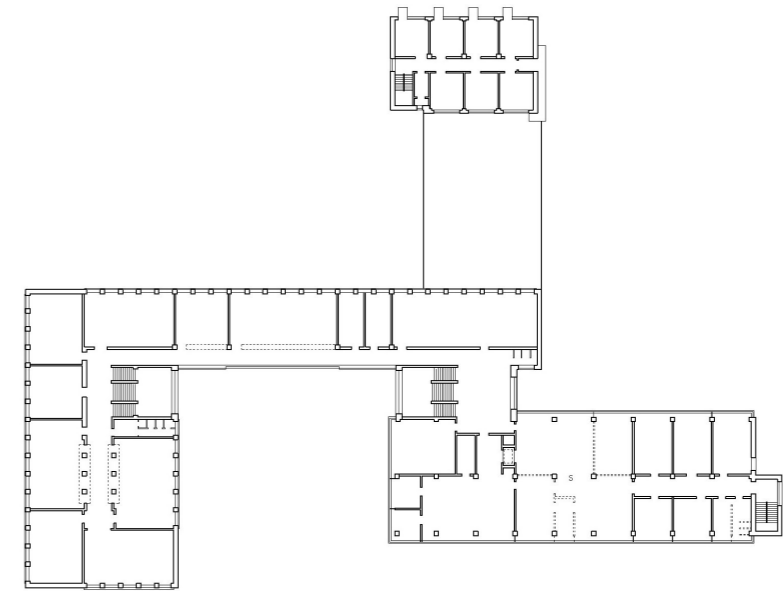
Second floor plan of Bauhaus Dessau (author’s own, redrawn from Sharp, 2002).
